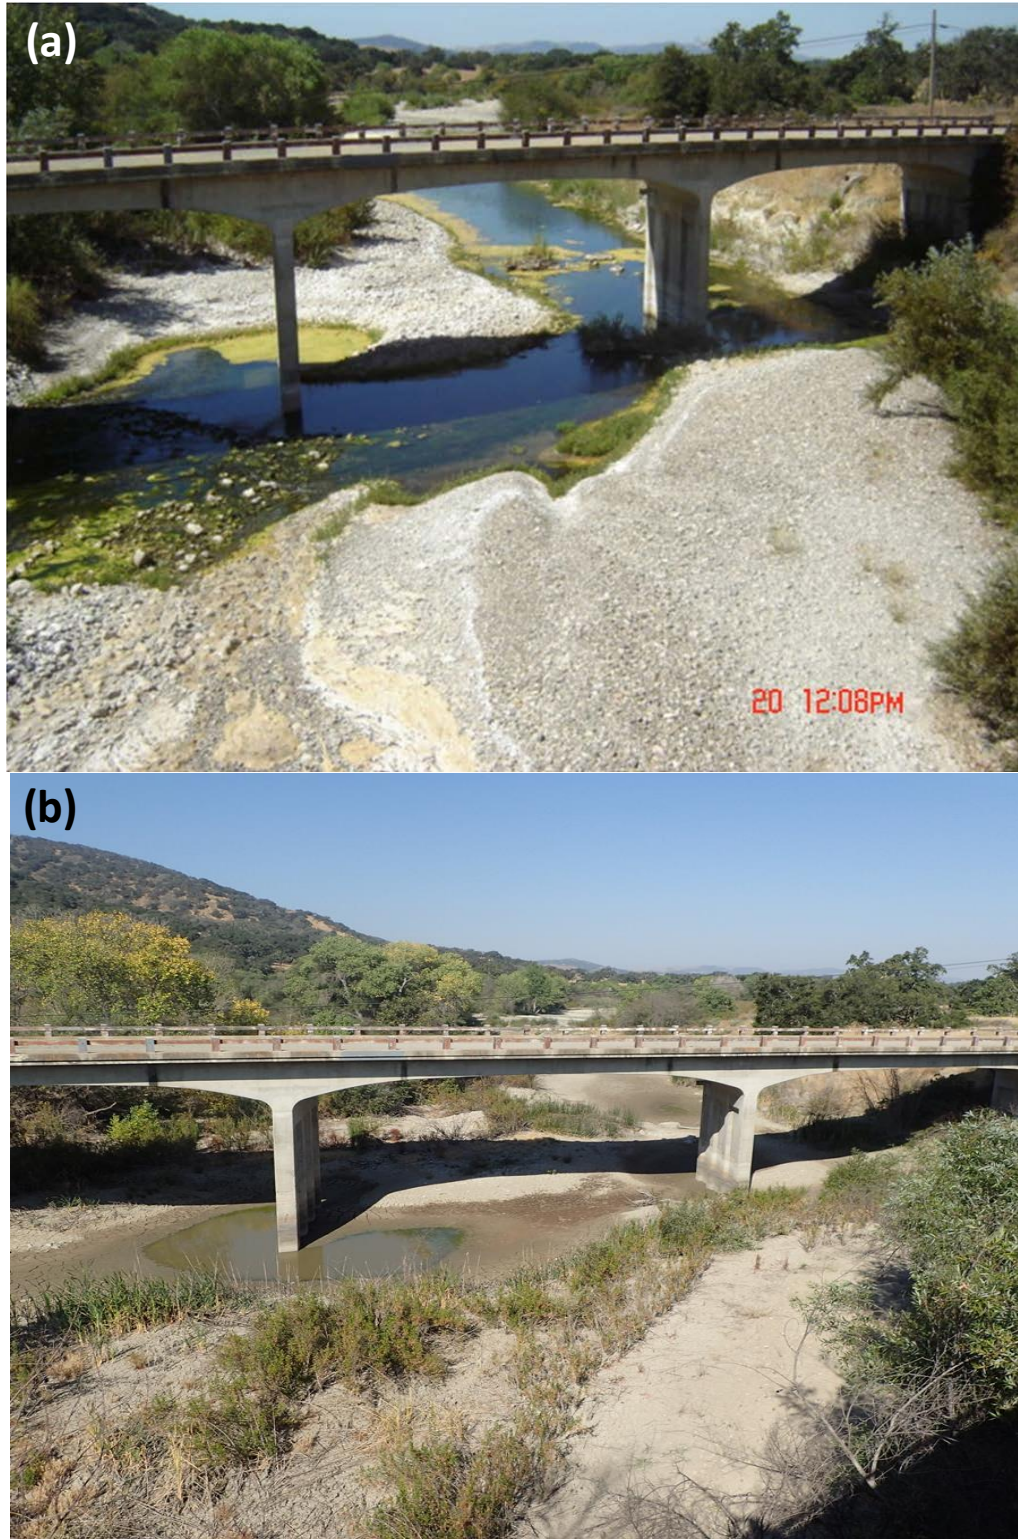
Photo points (M-6) collected at Highway 154 Bridge looking downstream in (a) September 2005 and (b) July 2017.
